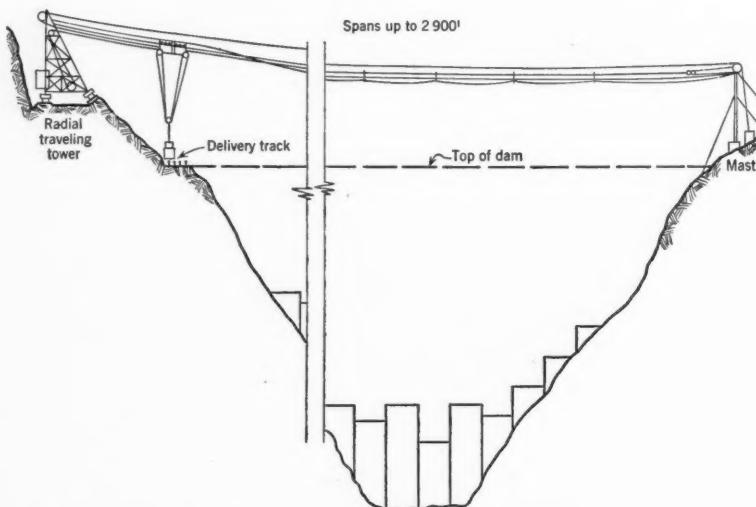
Placing concrete in short, high dams calls for overhead cableway equipment.
